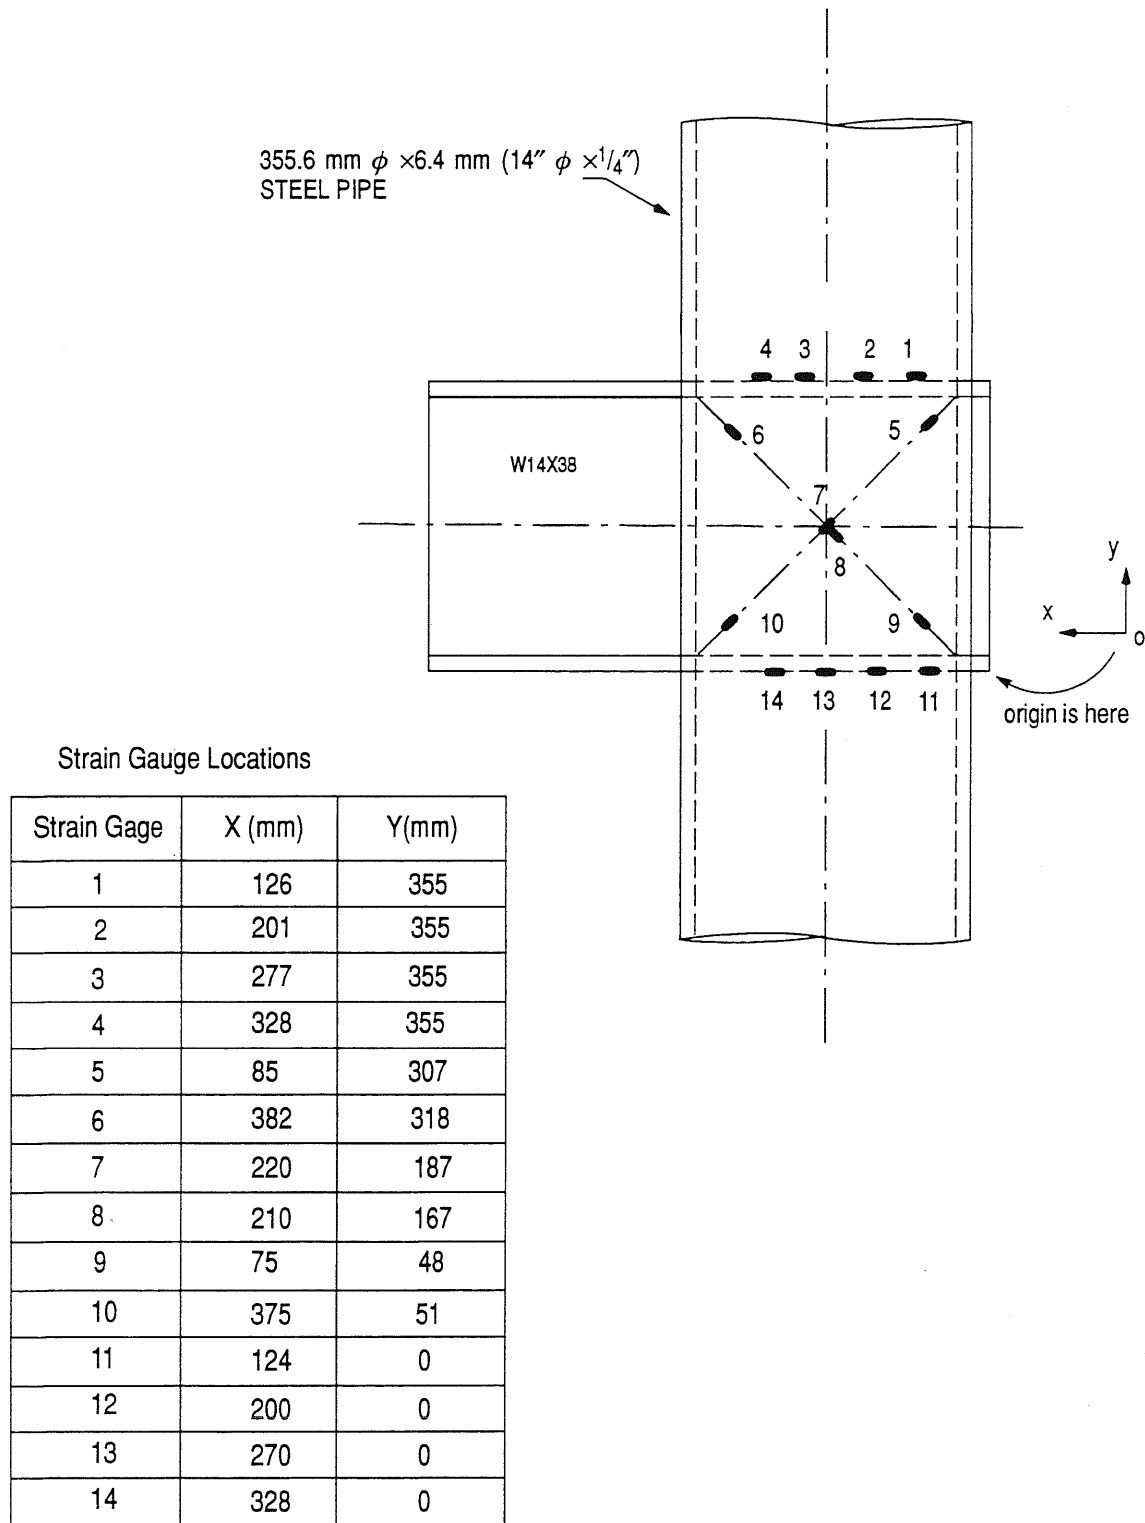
Instrumentation of the Beam Stub within the Column, Connection *Type VII
